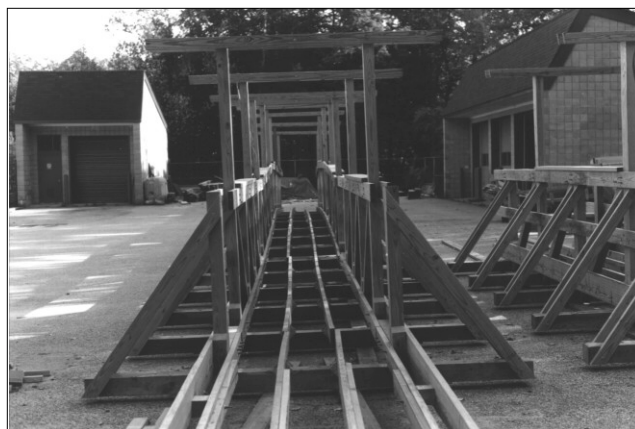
Entire walkway truss frame was prefabricated at Wawayanda State Park. Photo courtesy of Mr. Stephen Klein, Jr.
